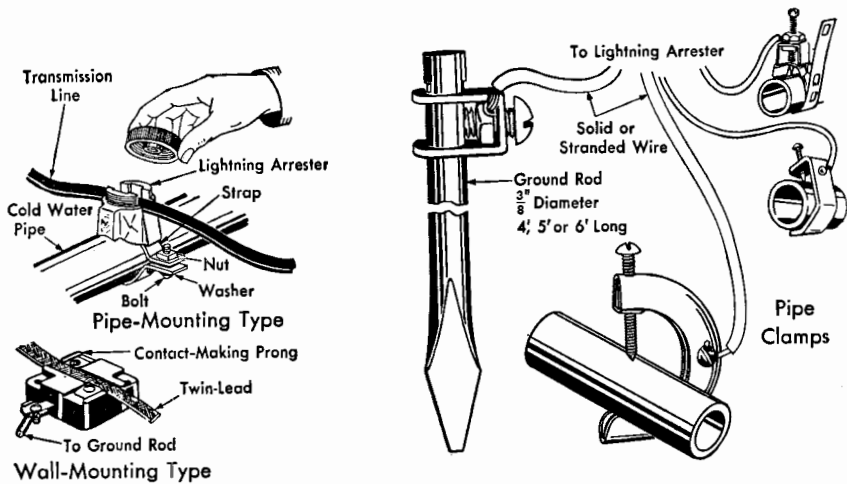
Examples of lightning arresters, ground rods, and pipe clamps
